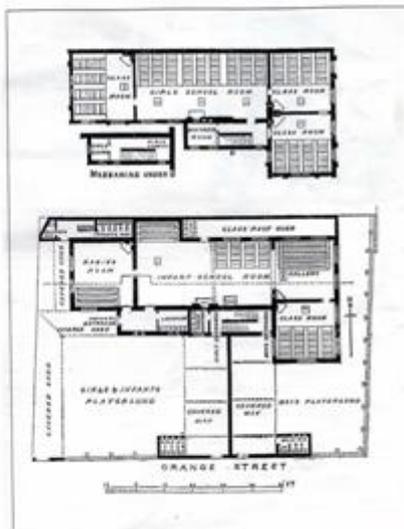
Planned layout for Orange Street School E.R. Robson School Architecture
